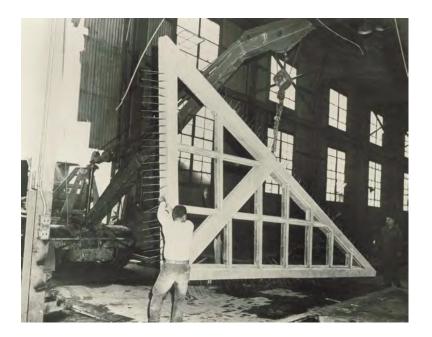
Pre-cast concrete panel in the shop of the Long Island by Precast Building Sections, Inc. The two rows of rebar protruding from the edge of the panel were wrapped around the rebar installed between the panels when set in place on site. Courtesy of the First Presbyterian Church of Stamford archives.
